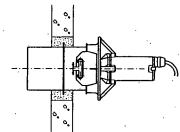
Circulation pump type SR. Installation on wallpipe and with guide rails.
